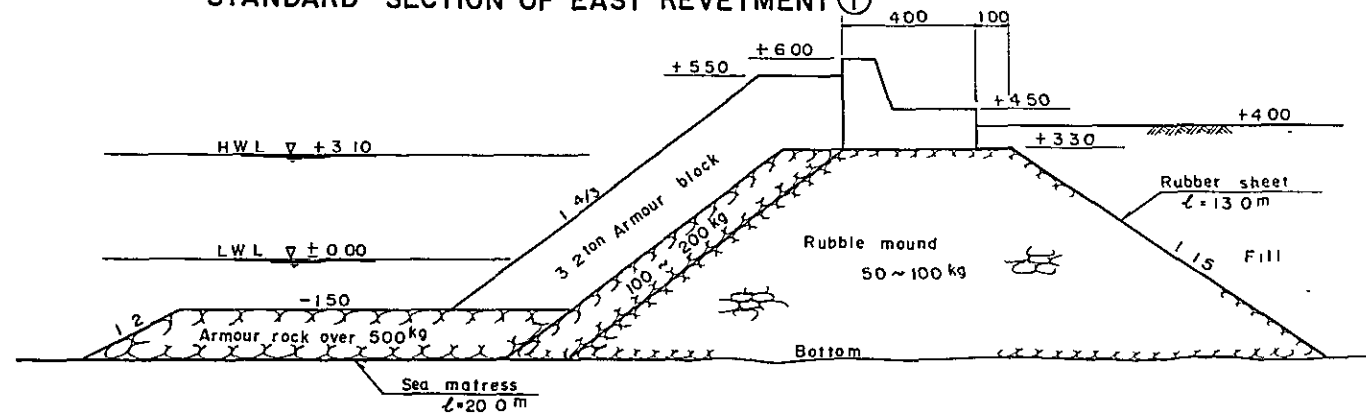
(b) STANDARD SECTION OF OUTER FACILITIES
